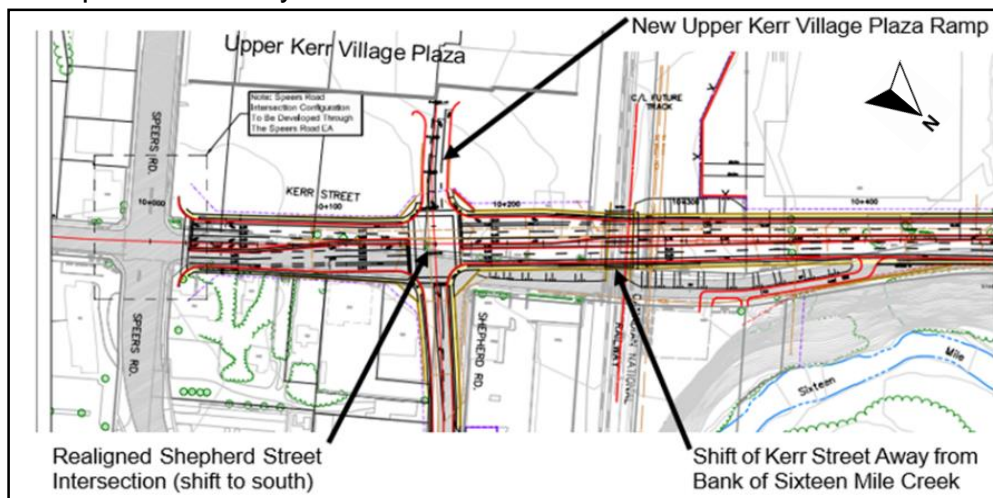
Plan Illustrating Alignment of Kerr Street and Access to Subject Lands
